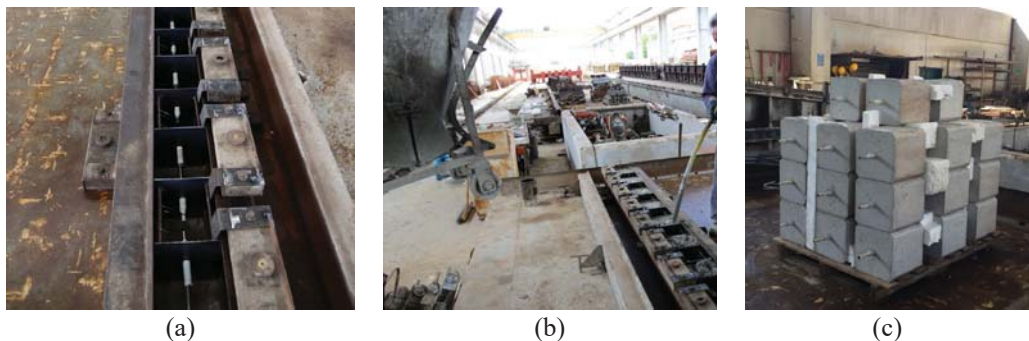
$c/d = 7.83$ bond specimens: realization of the samples in the precast plant. (a) battery of the steel formwork, (b) vibration of the concrete after the casting, (c) specimens after the curing stage.
